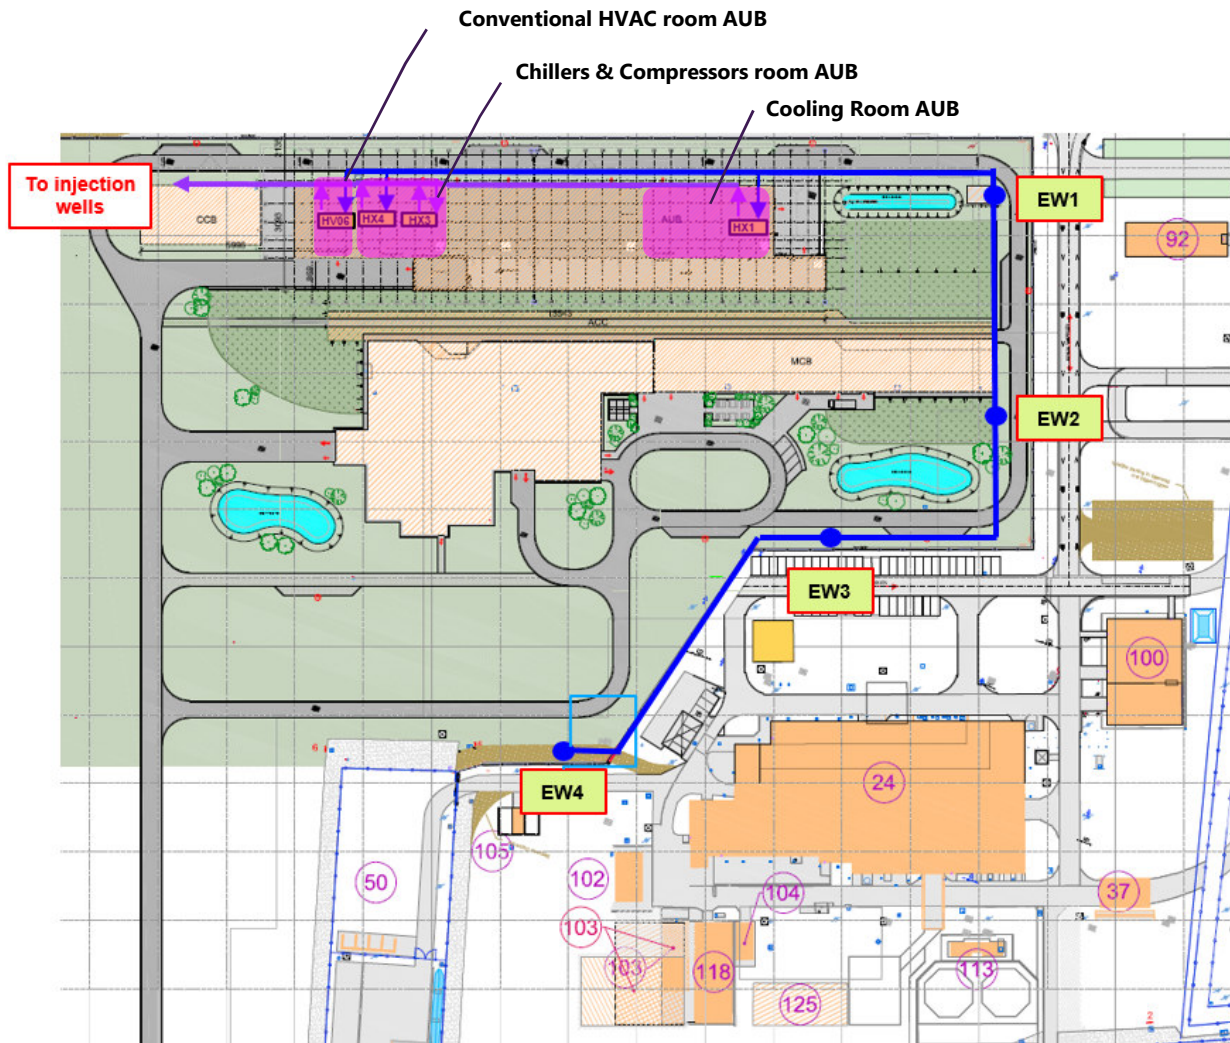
Conceptual sketch of the geothermal cooling extraction wells (EW) and pipe routing ([Ref.5])
